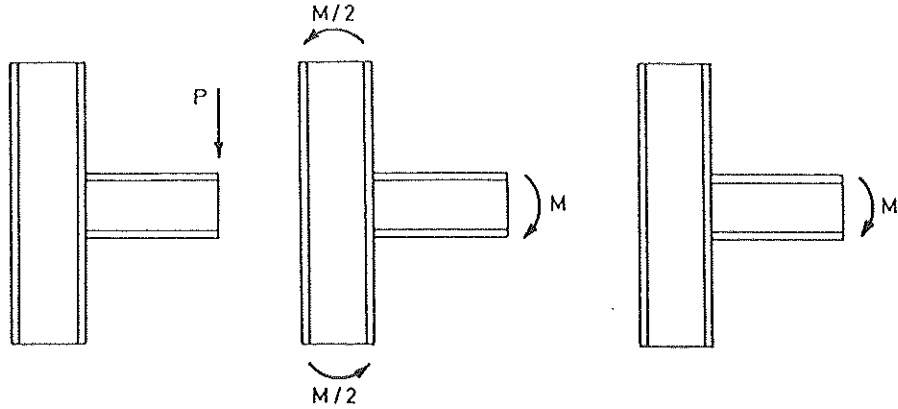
Definition of two welded joints ("T" arrangement)
